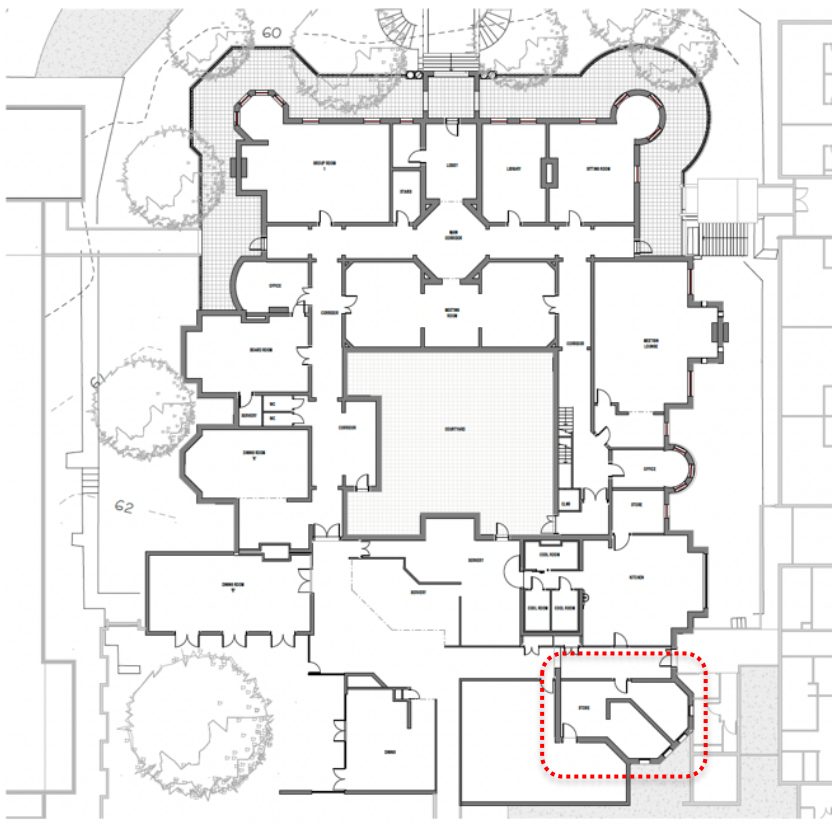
EXISTING GROUND FLOOR PLAN. Hexagonal stone storage building outlined in red.
